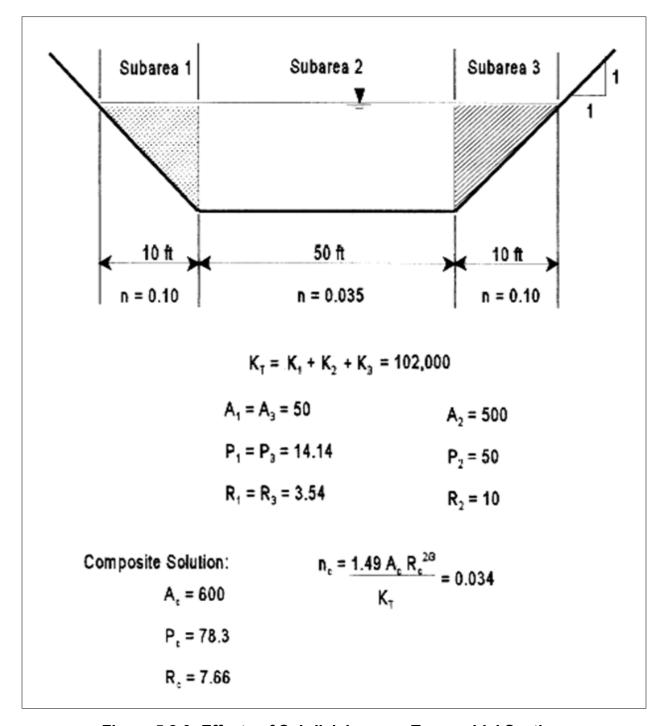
Effects of Subdivision on a Trapezoidal Section
